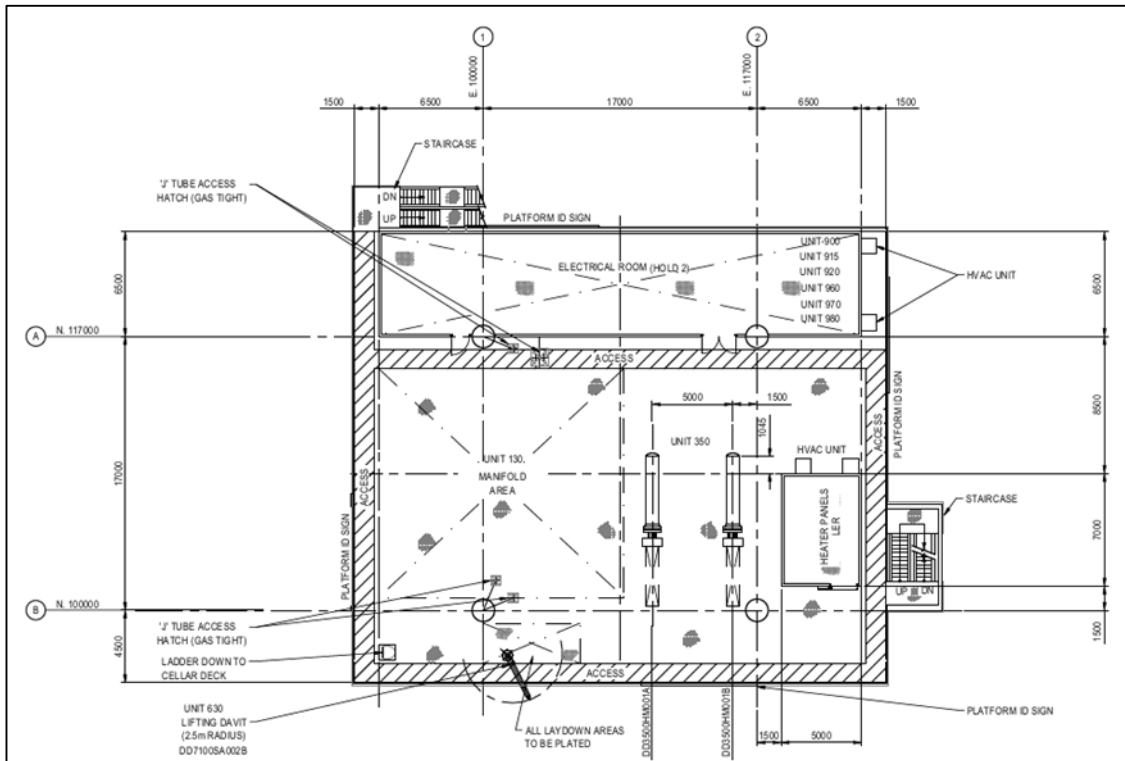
New Douglas Platform – Section of Mezzanine Deck
